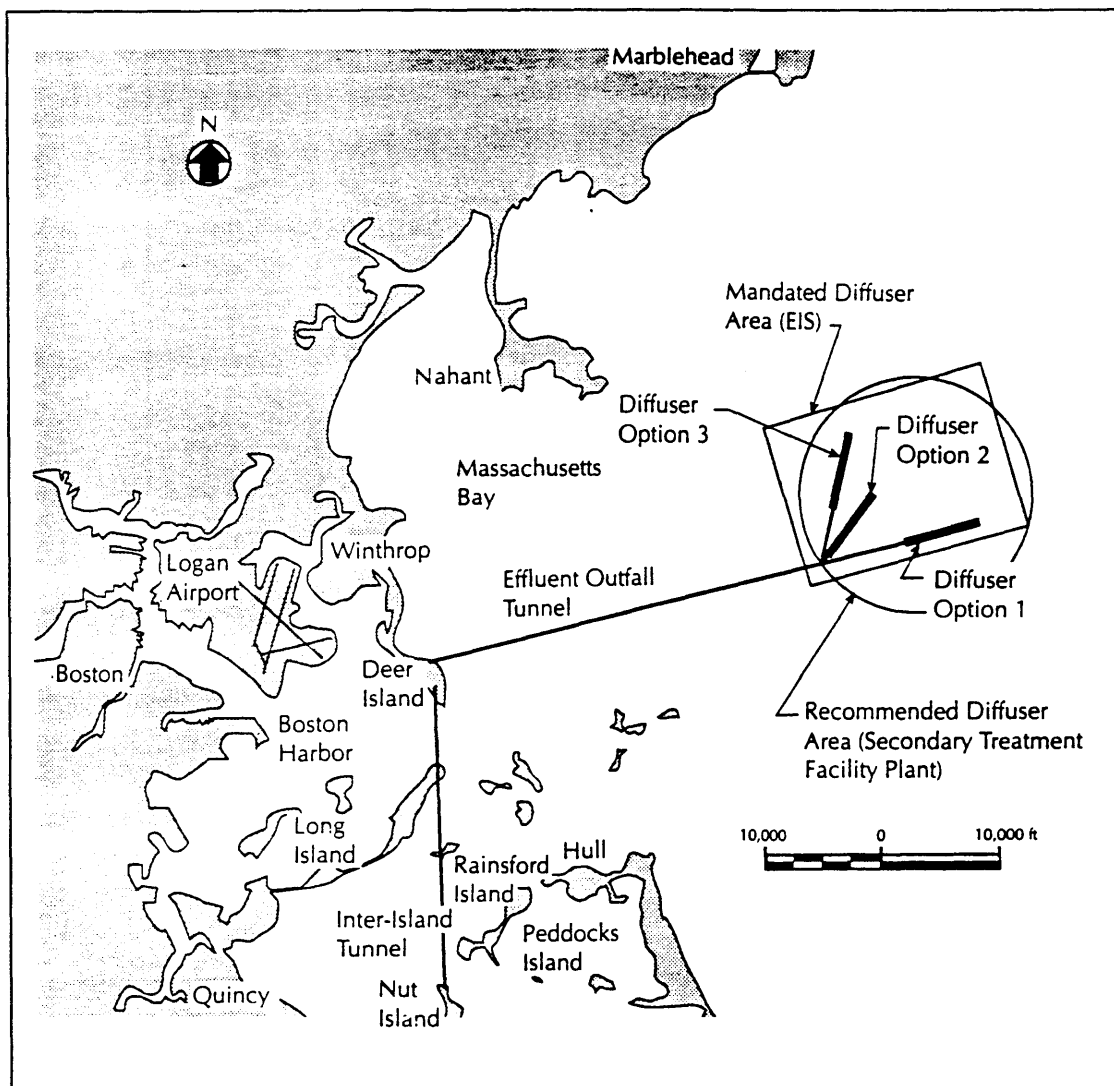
Plan of the Boston Harbor showing Effluent Outfall Tunnel
